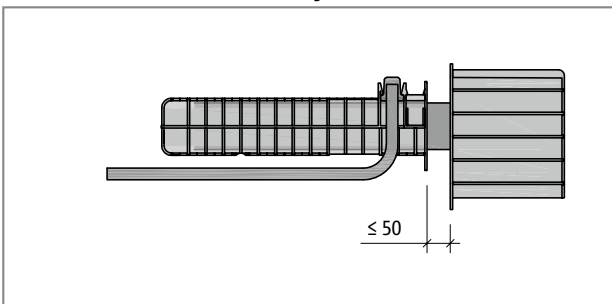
Schöck Tronsole® type Q: Installation variant joint width ≤ 50 mm
